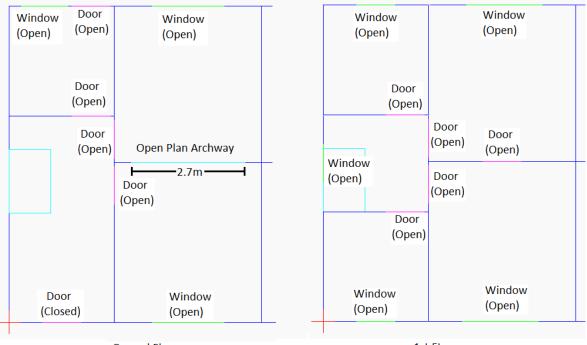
Alternative single sided ventilation design - night-time window and door opening floor plan
